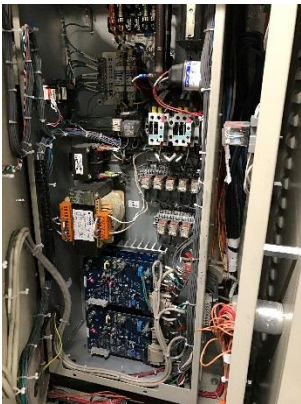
Inner cabinet layout of elevator controller (cooling fan located at top)
